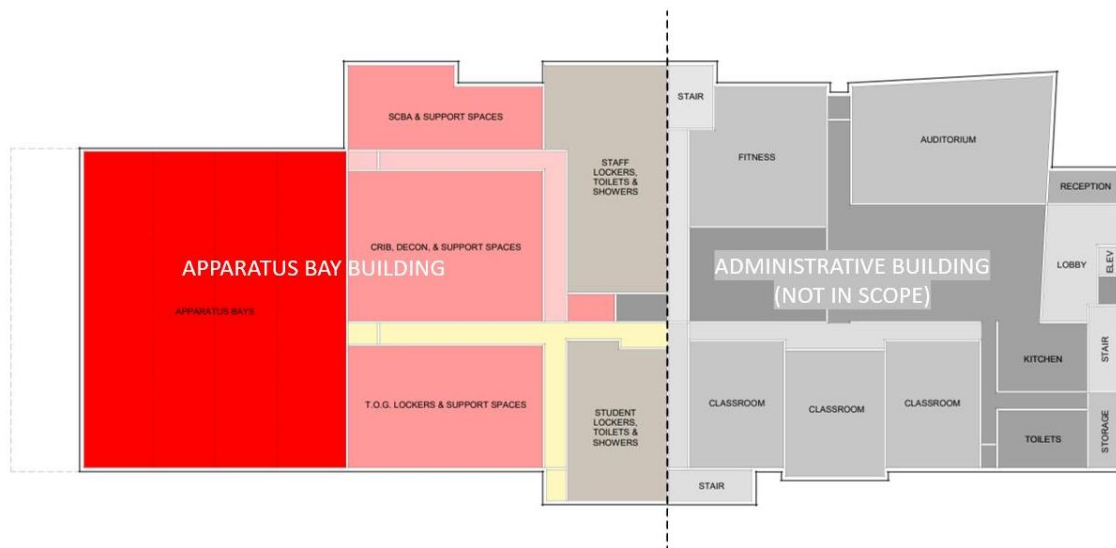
Conceptual Plan for DFS Bridgewater Apparatus Bay Building (left) and Administrative Building (right) by Dore & Whittier Architects
